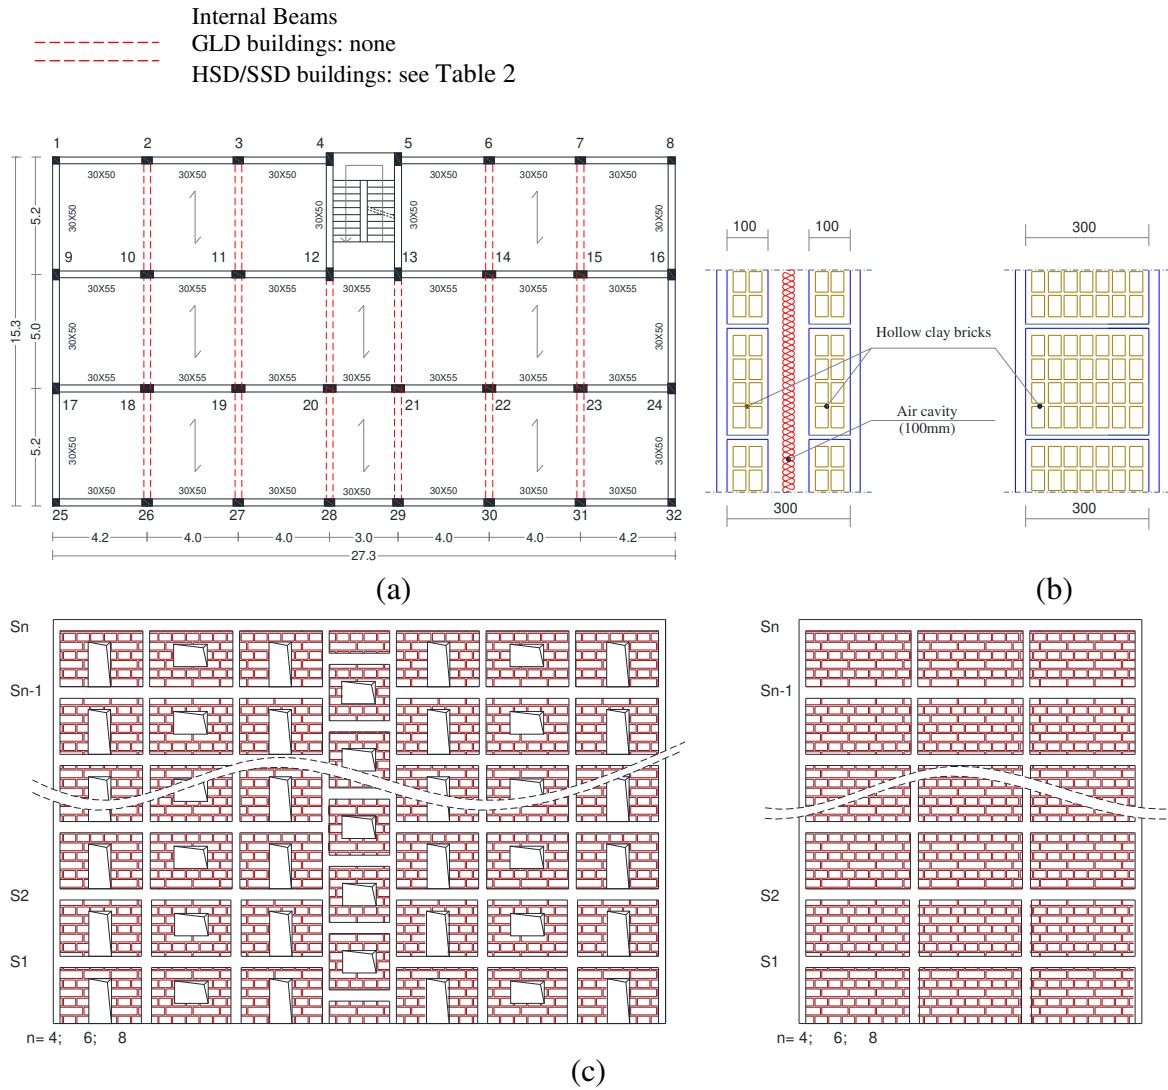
Selected case-study buildings: (a) plan view, (b) masonry infills configuration and (c) lateral view
